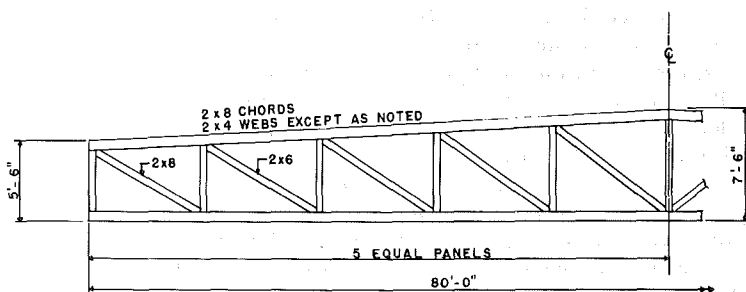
Church Roof Truss (1 in. = 25.4 mm)
